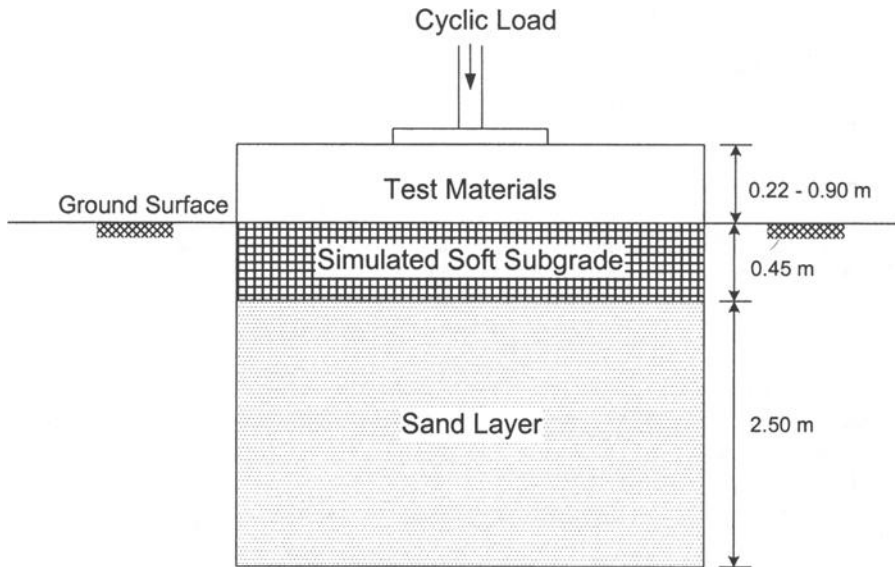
Schematic Cross Section of Large-Scale Model Experiment (LSME).
